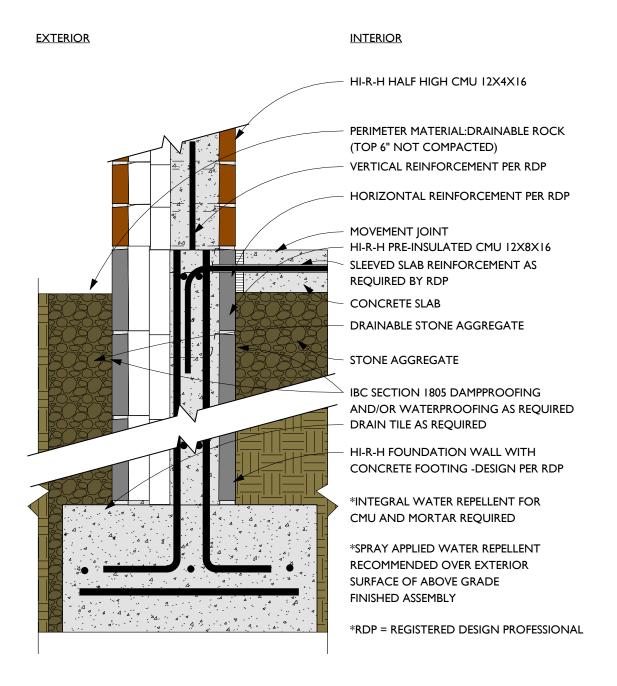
HI-R-H Half High - CMU Foundation
